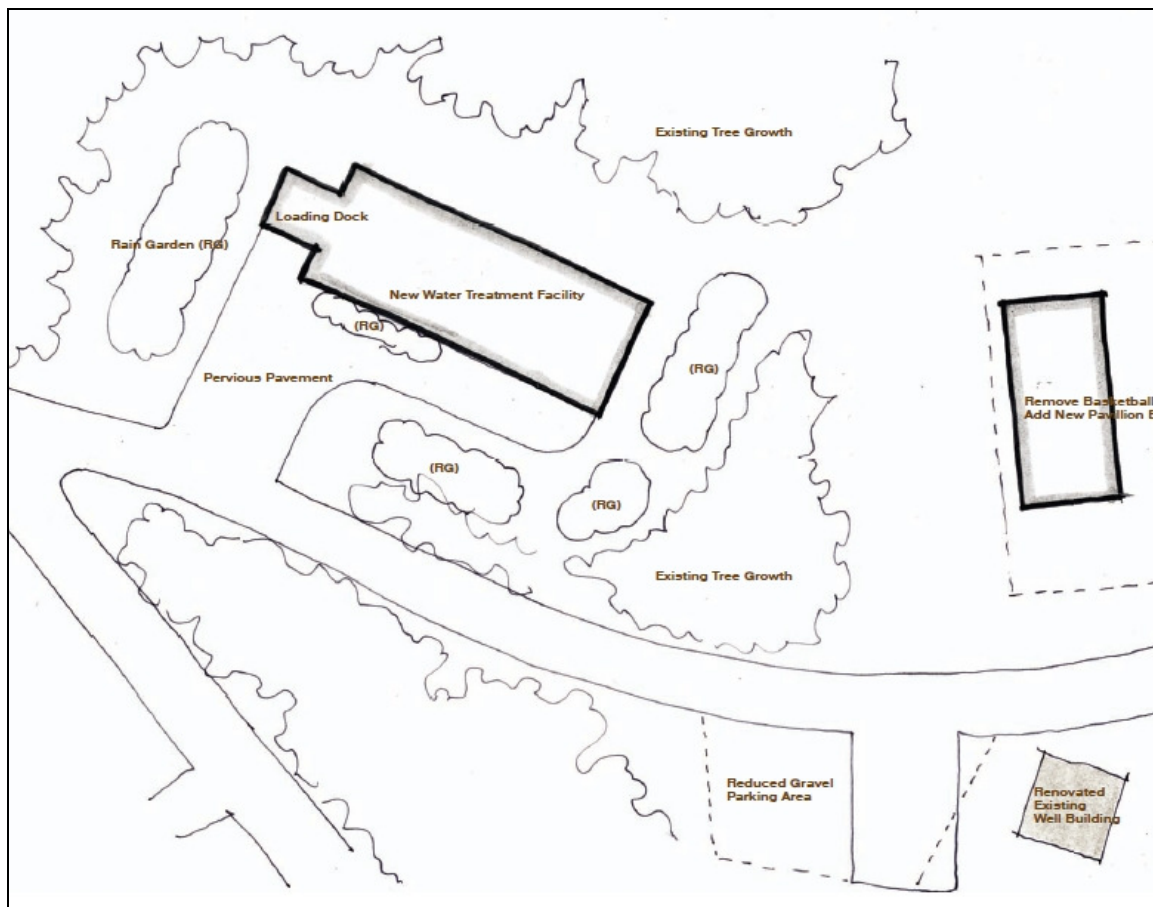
Gilman Park Groundwater Treatment Project – Preliminary Design of Proposed Site Layout (TMS Architects)
